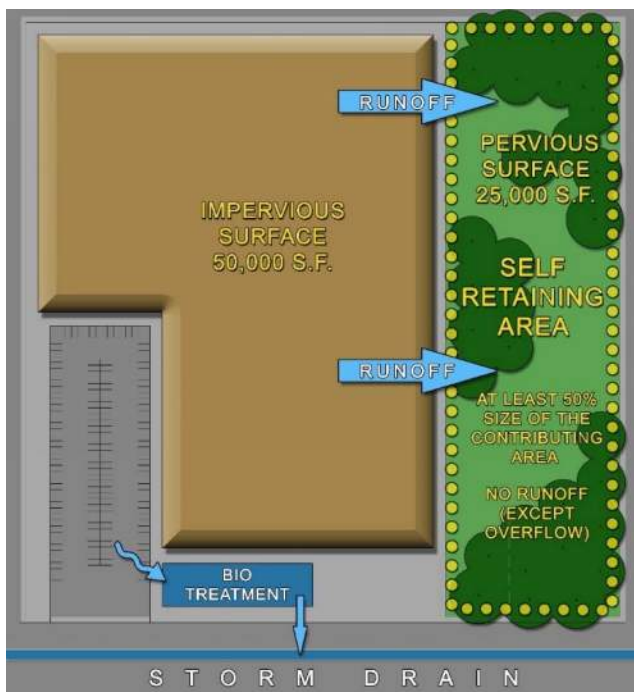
Schematic Drainage Plan for Site with a Self-Retaining Area
